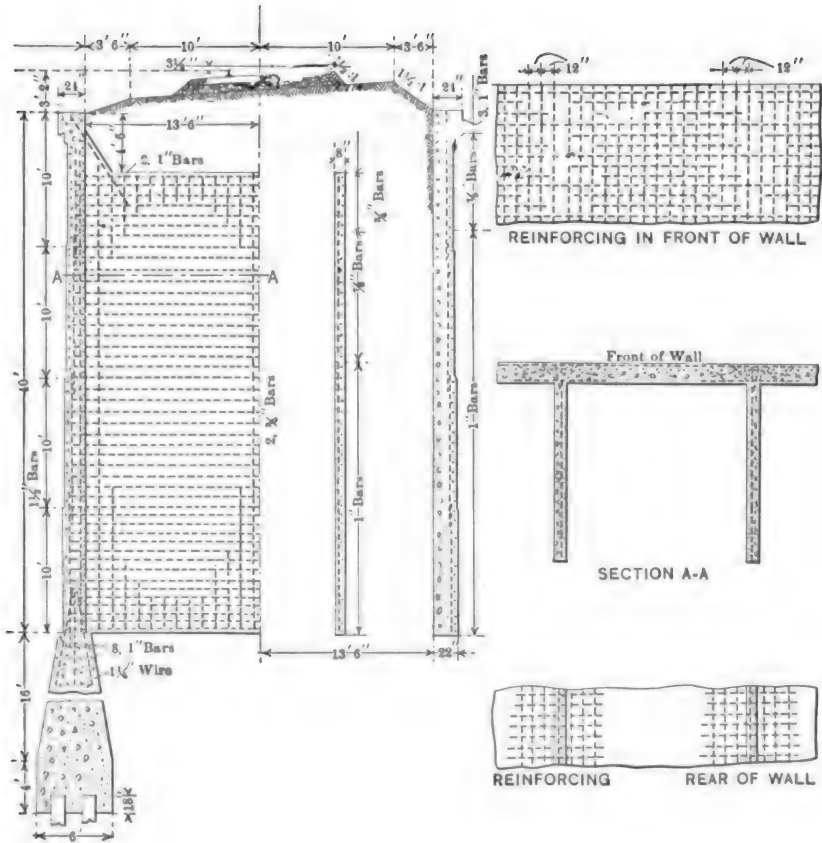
BOX ABUTMENT, WESTERN PACIFIC RY.
